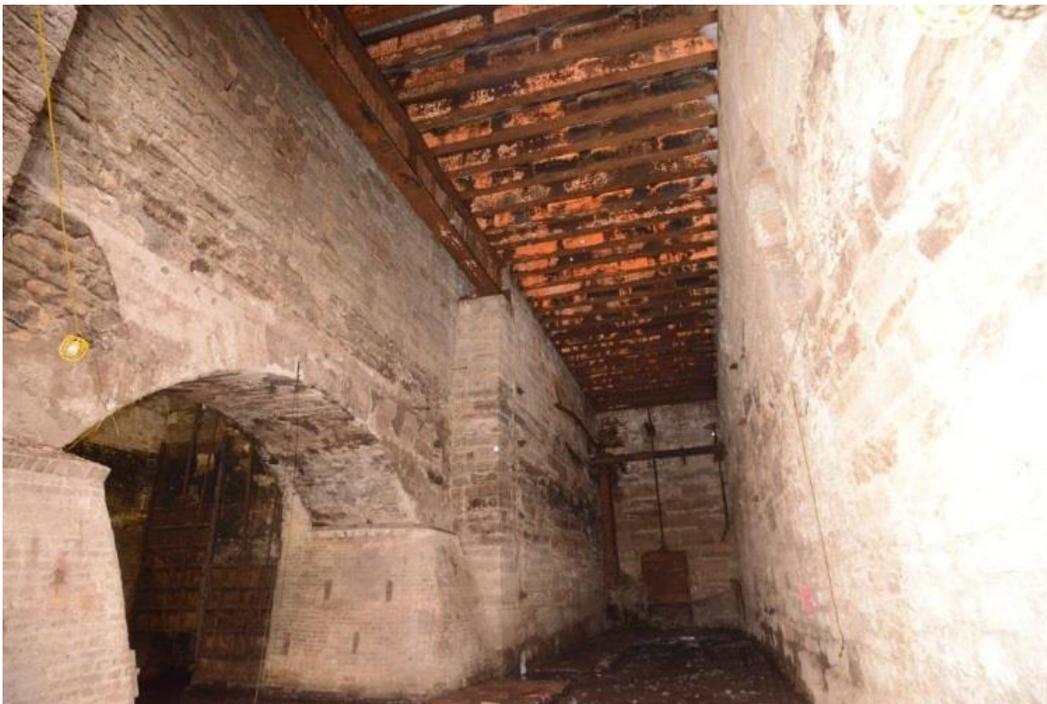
Overview of downstream tunnel section. Photograph by CNA Engineers, Inc., January 2014.
